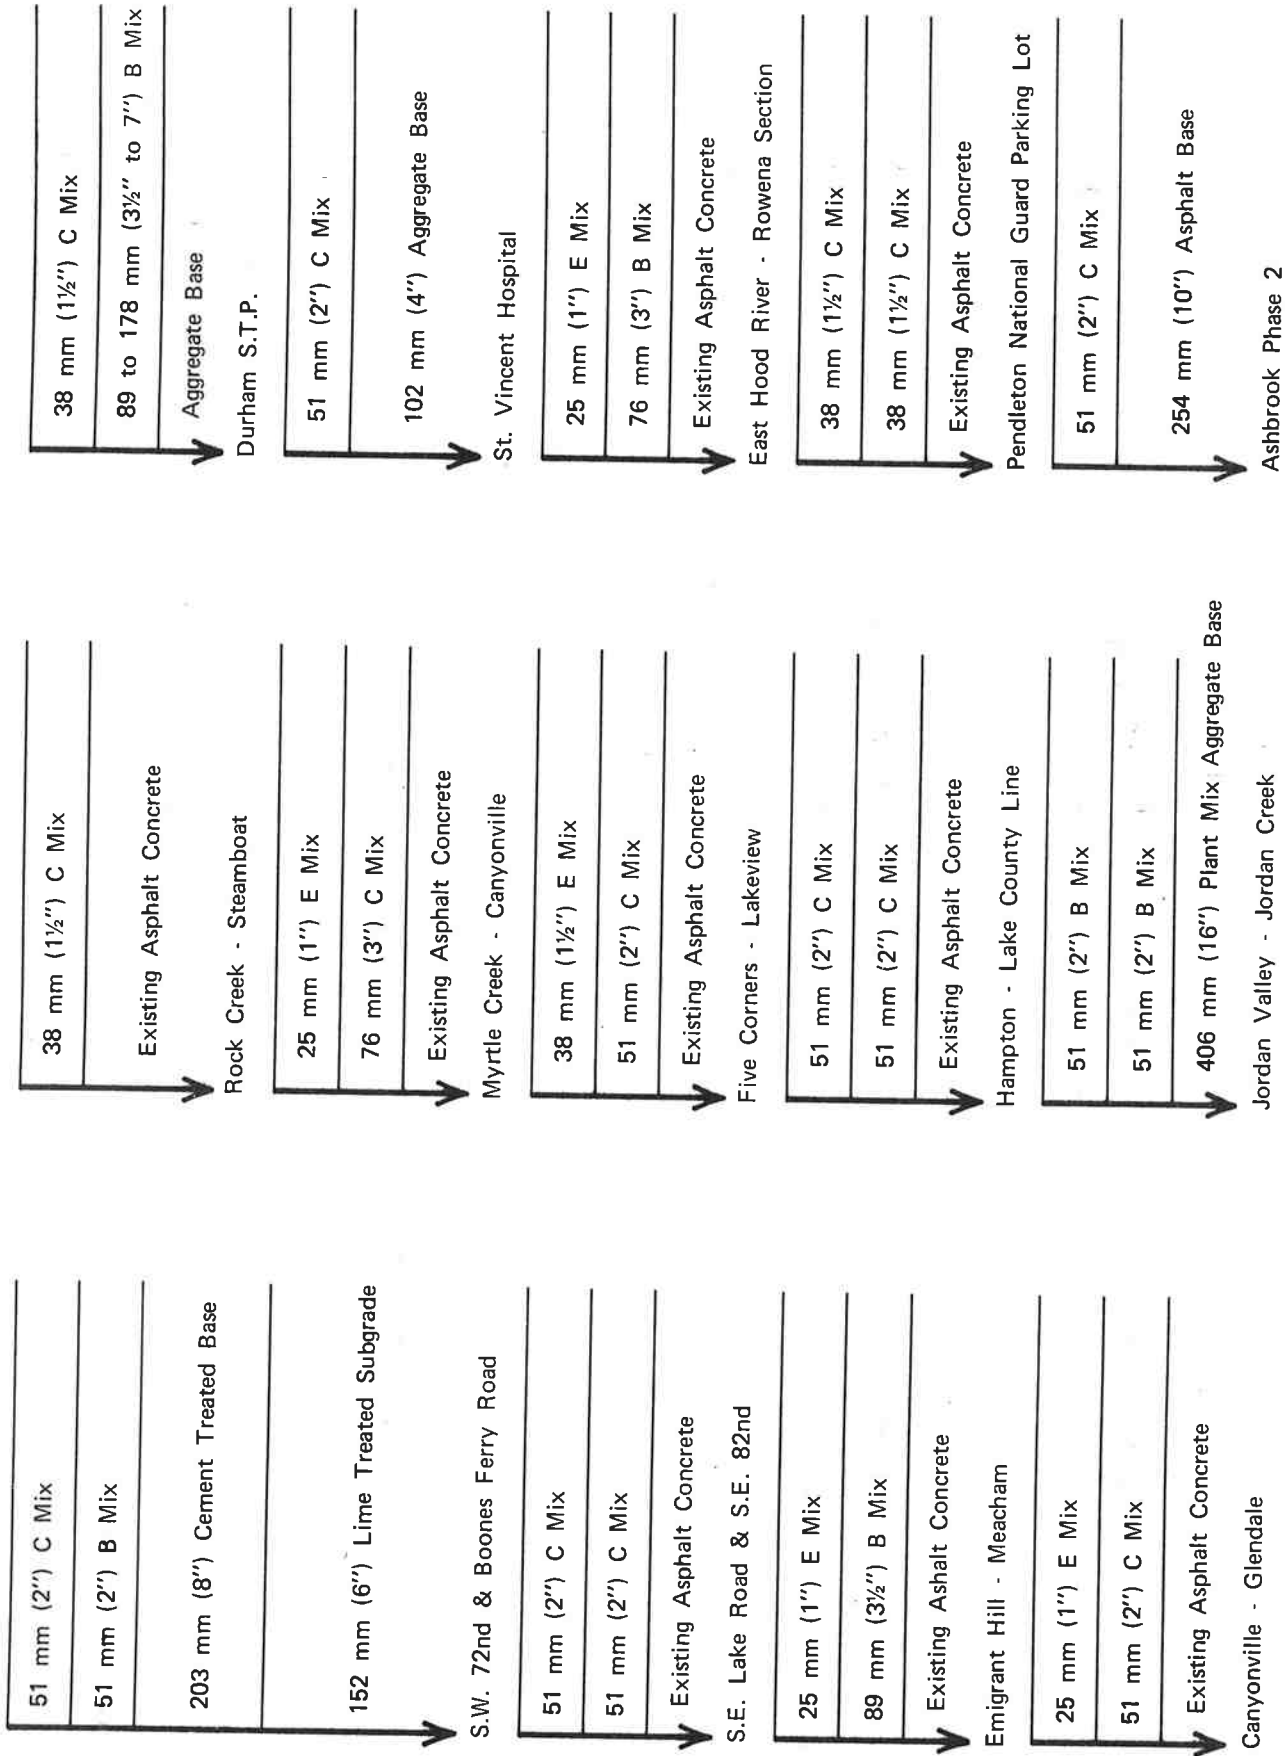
Typical Cross Sections for Pavement Sections Evaluated
